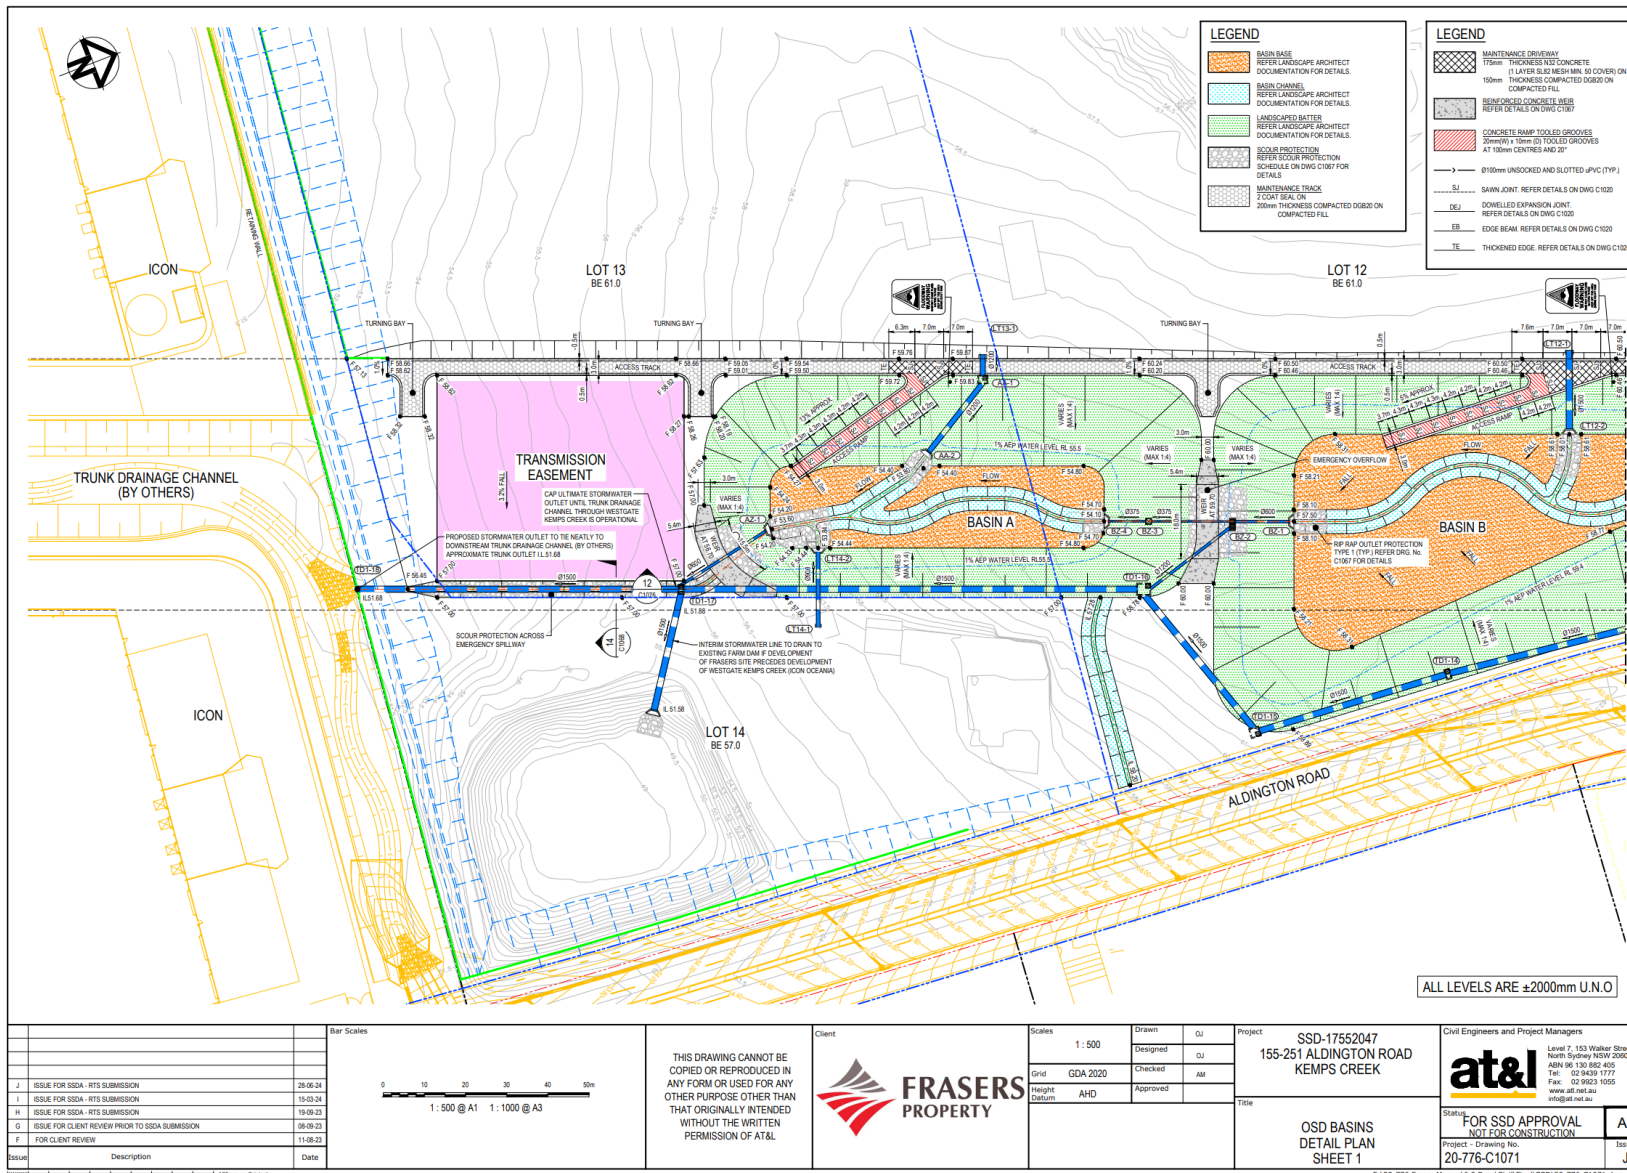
Proposed Stormwater Basins in Transgrid Easement
